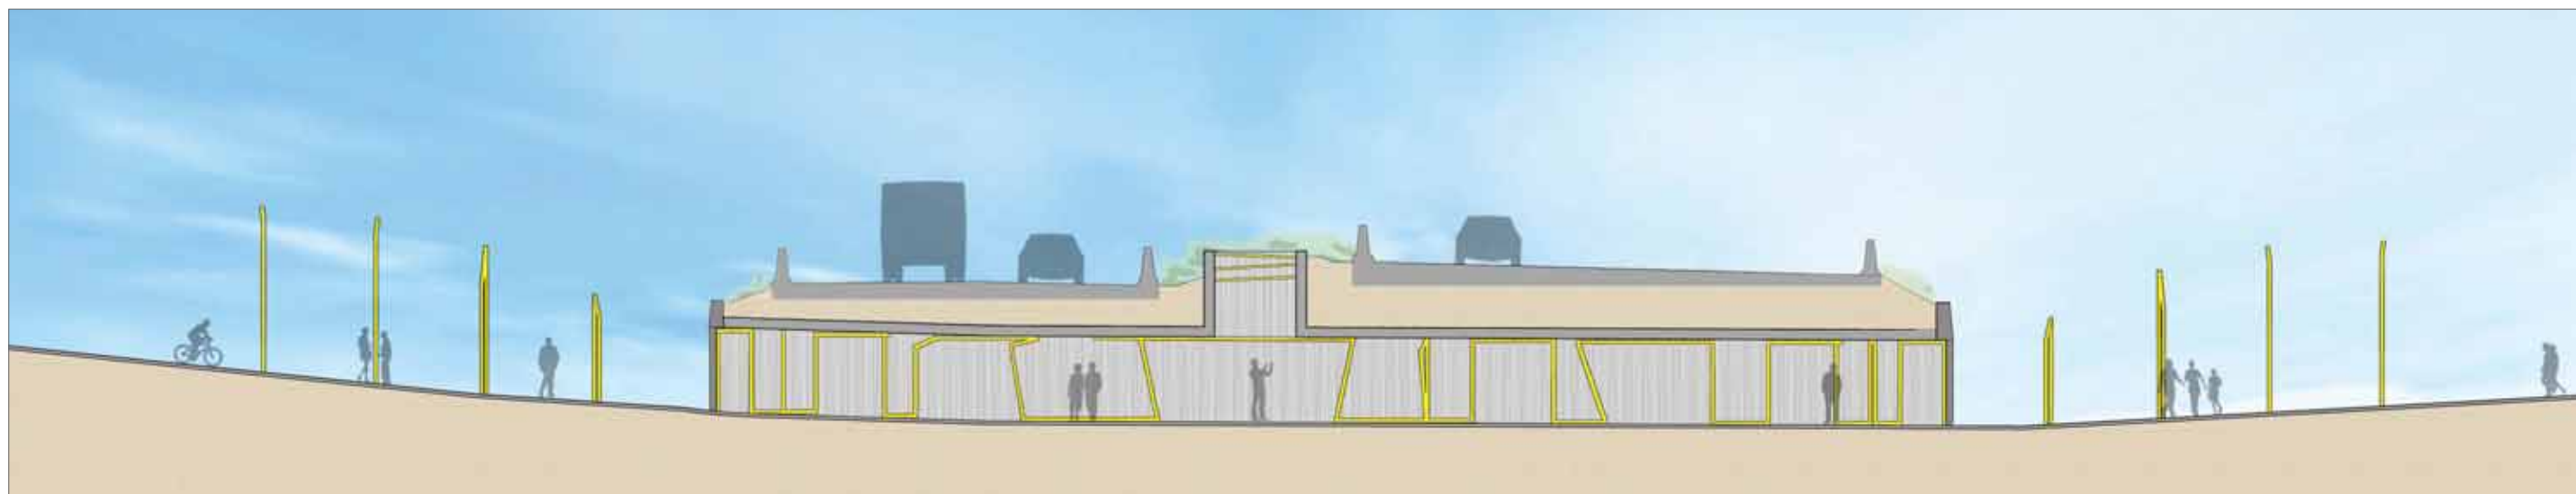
Long section through the optional underpass, showing concept treatment
